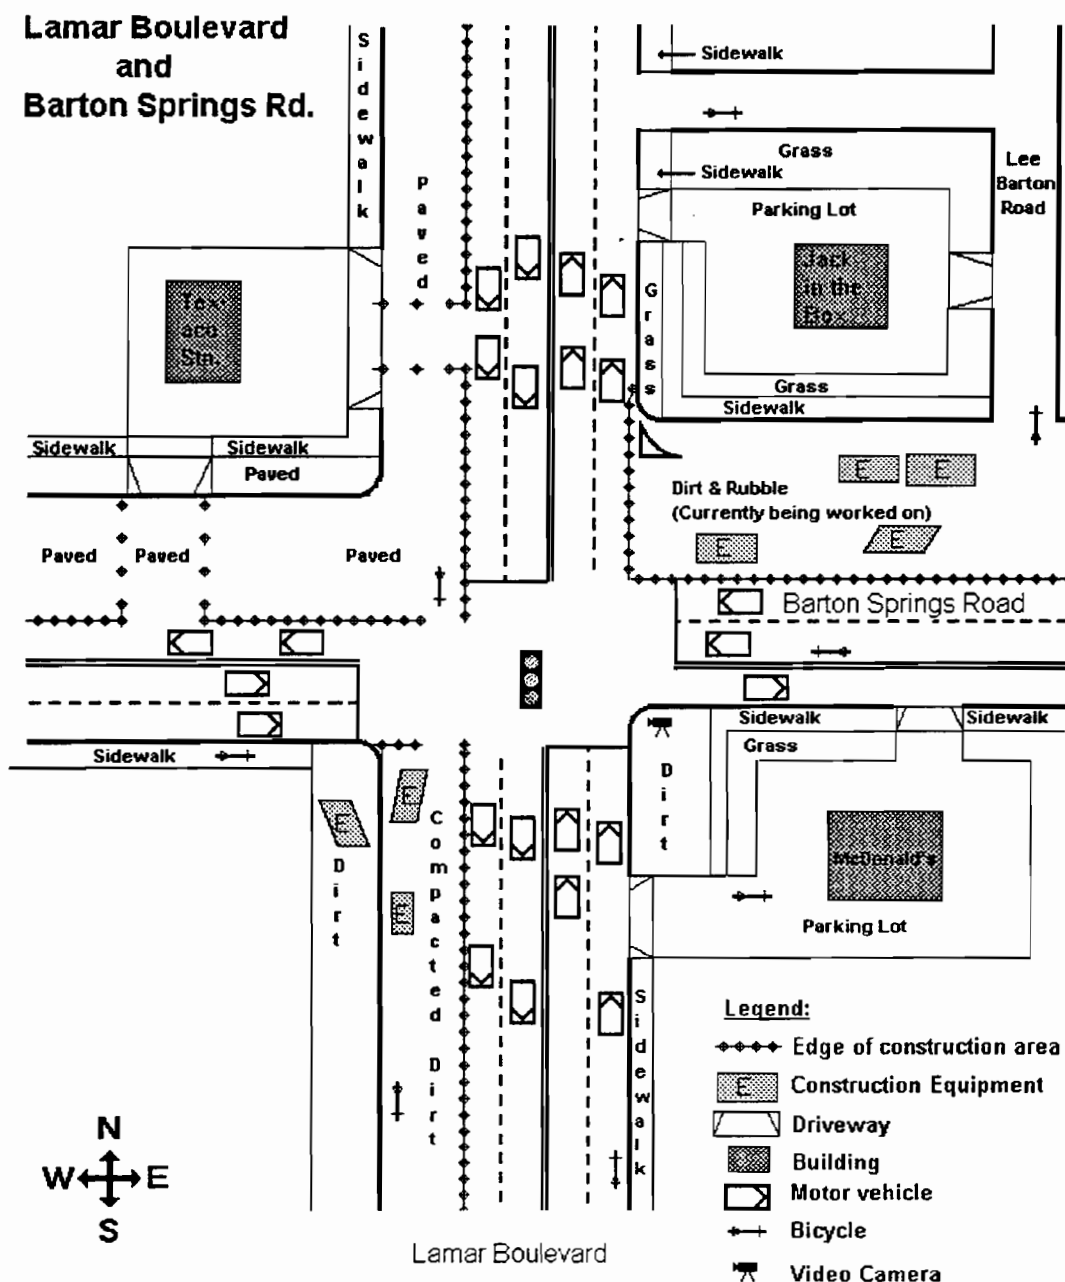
Diagram of Intersection of South Lamar Boulevard and Barton Springs Road while Under Construction to Widen Both Roadways NOT TO SCALE
